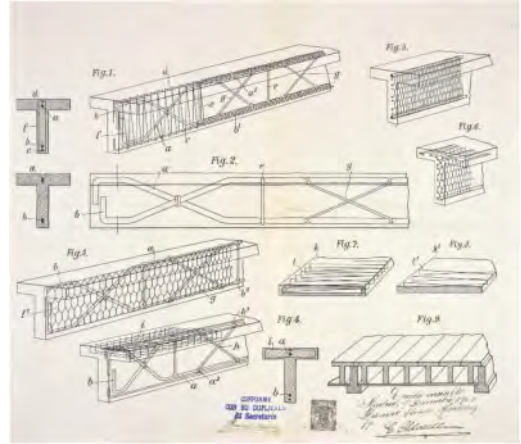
Lavanchy, Spanish patent number 37371, steel reinforcement arrangement, 1906.
